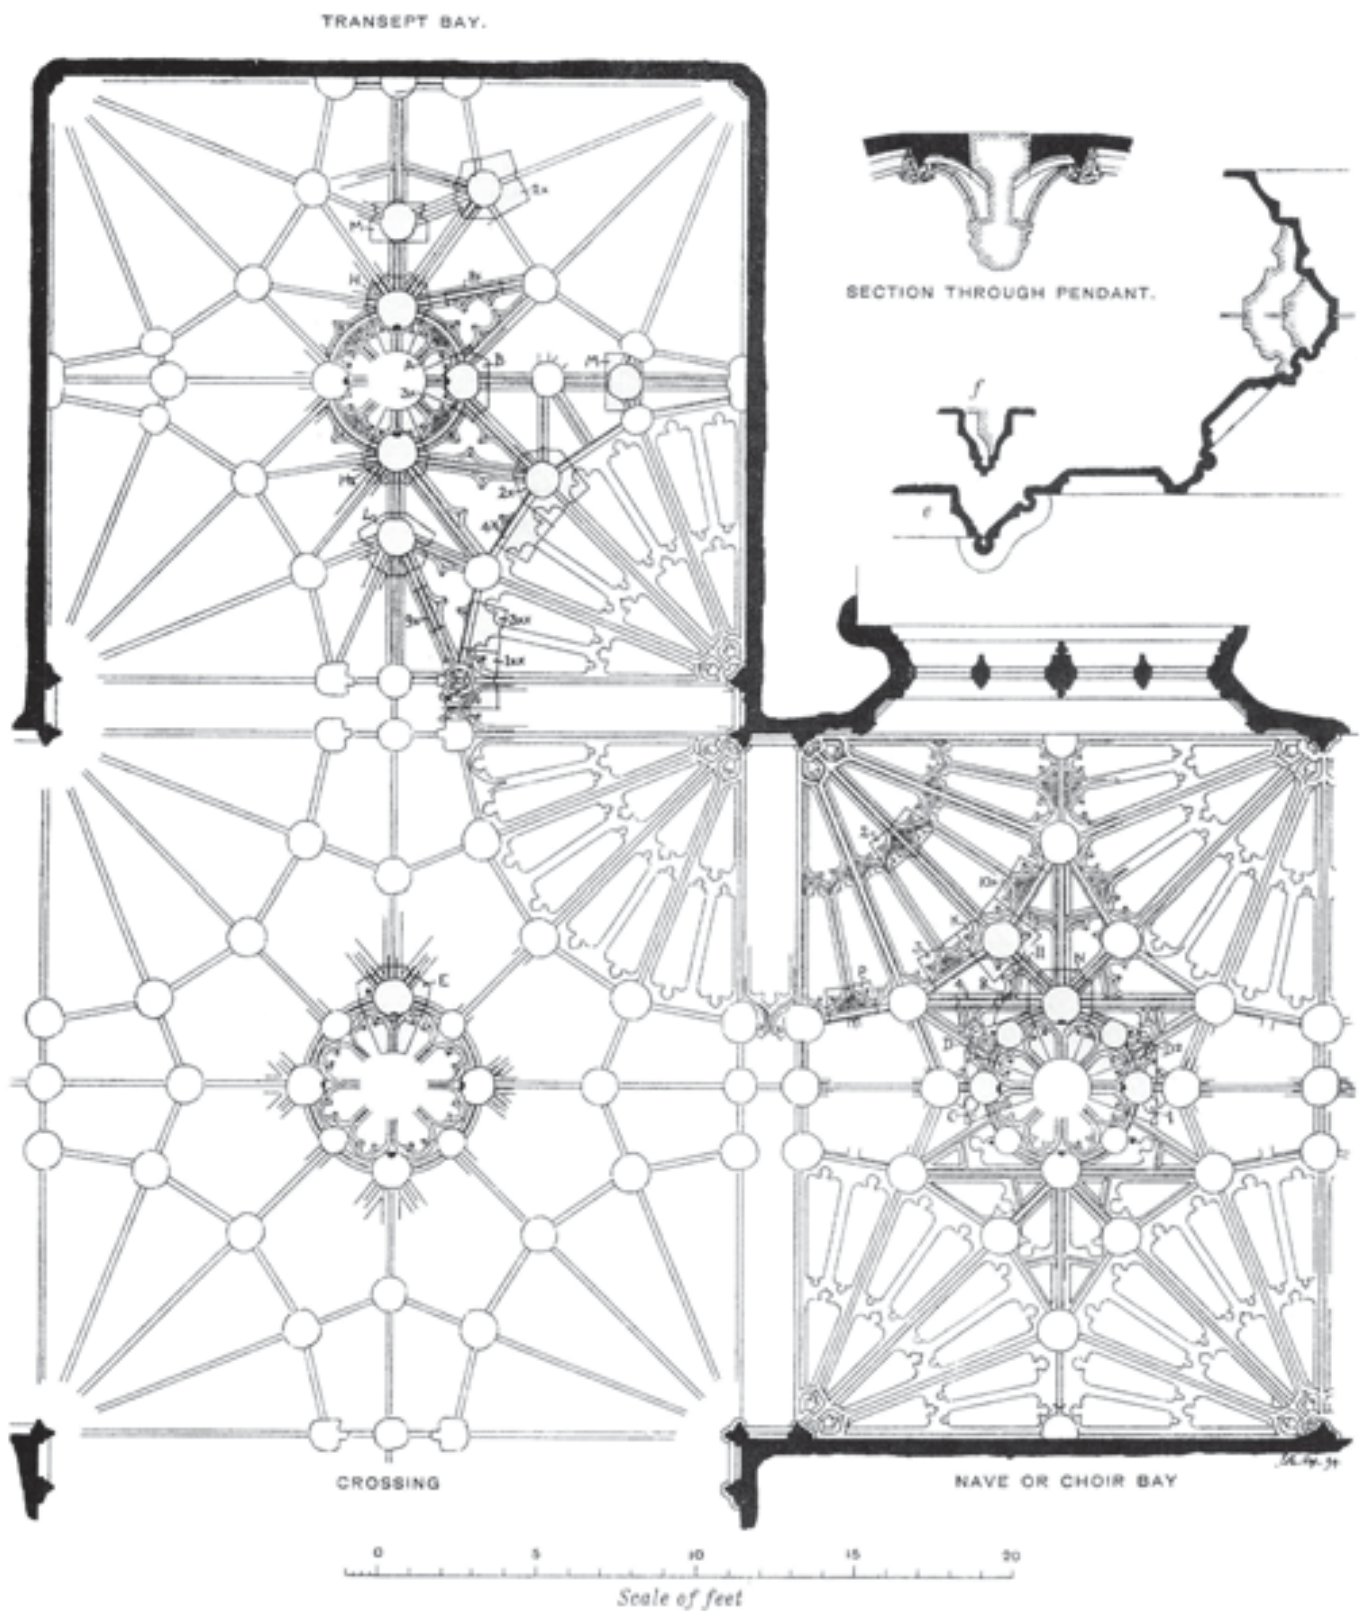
Reconstructed plan of the three vault designs in Stillington's chapel, based on excavated fragments. After Buckle 1894
